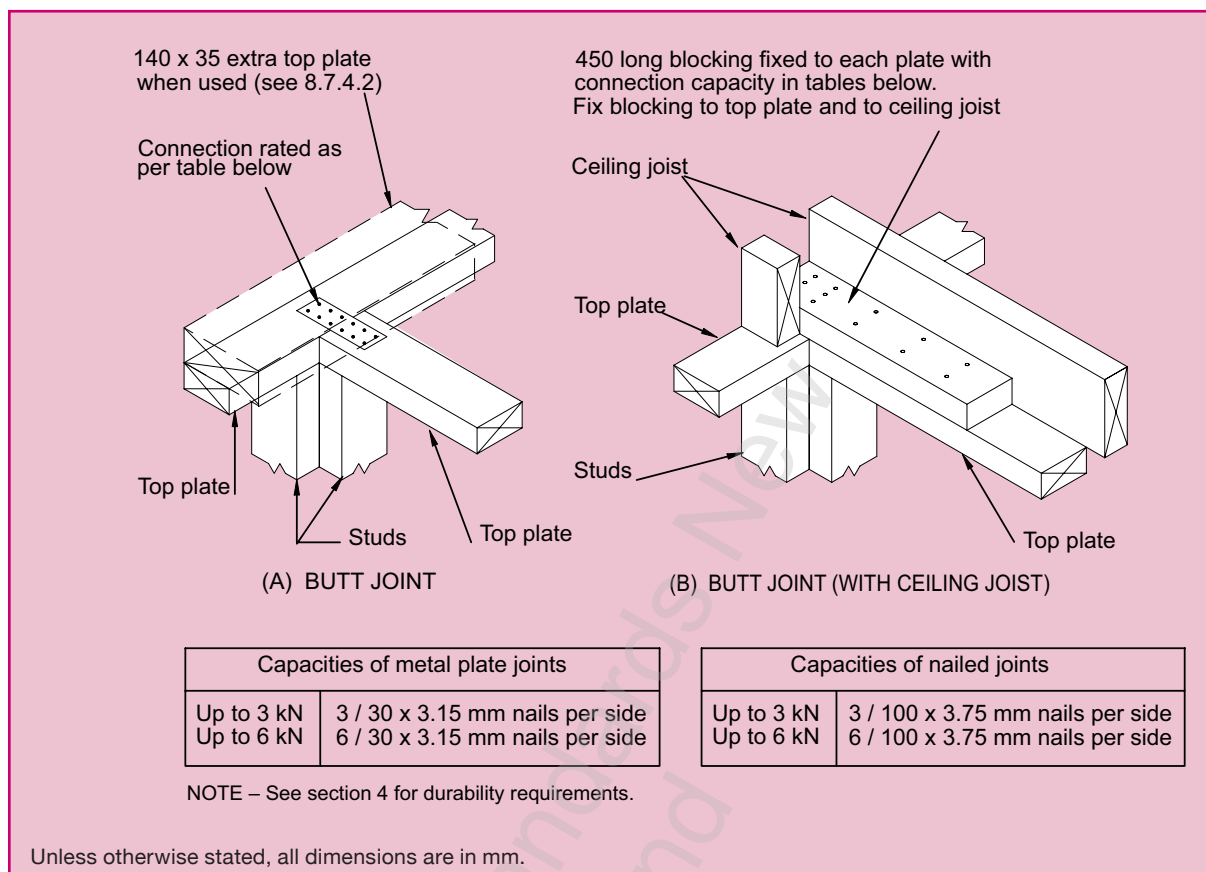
Connecting top plates to external walls at right angles – Walls containing bracing (see 8.7.3.4)
